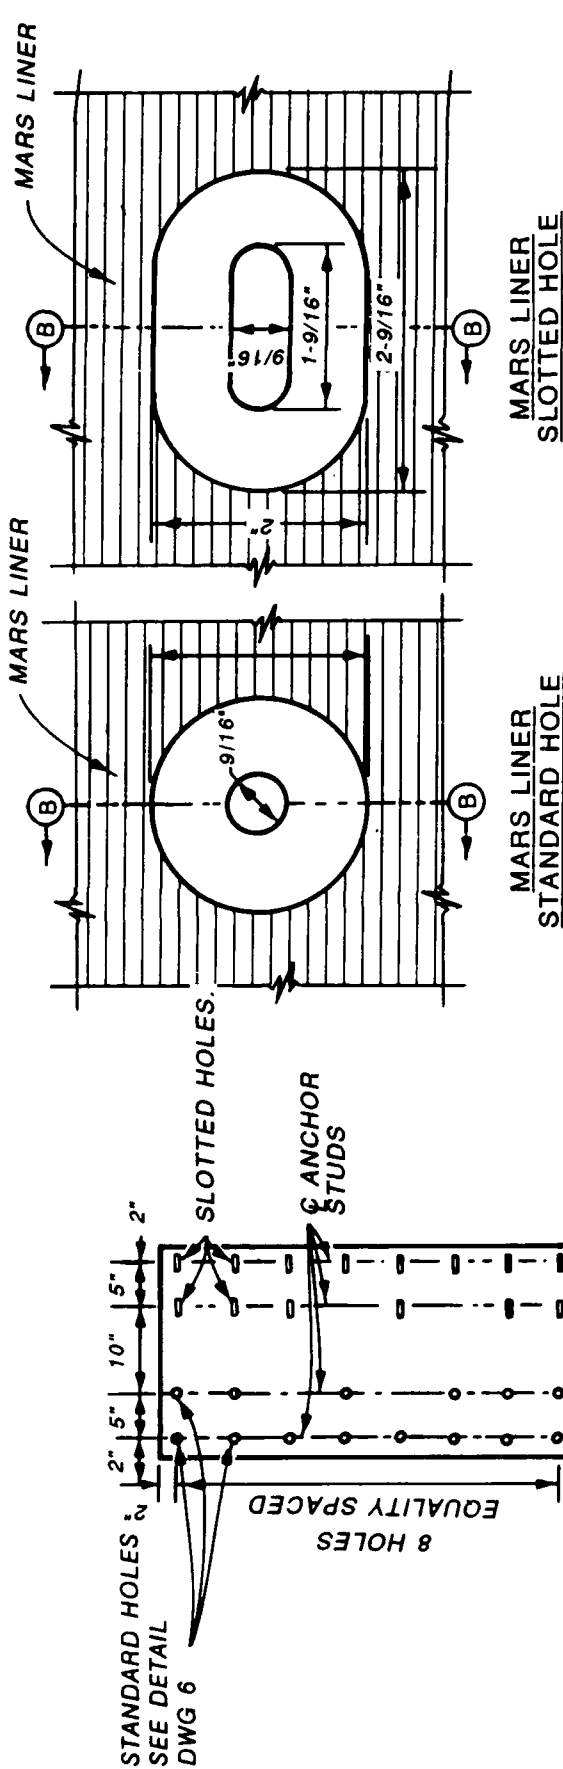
Monolith joint repair details for joints 15N, 31N, and 34N, Algiers Lock
